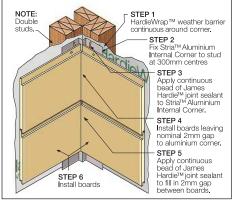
ALUMINIUM 14MM CORNER DETAIL -STANDARD AND WIDE PROFILE
